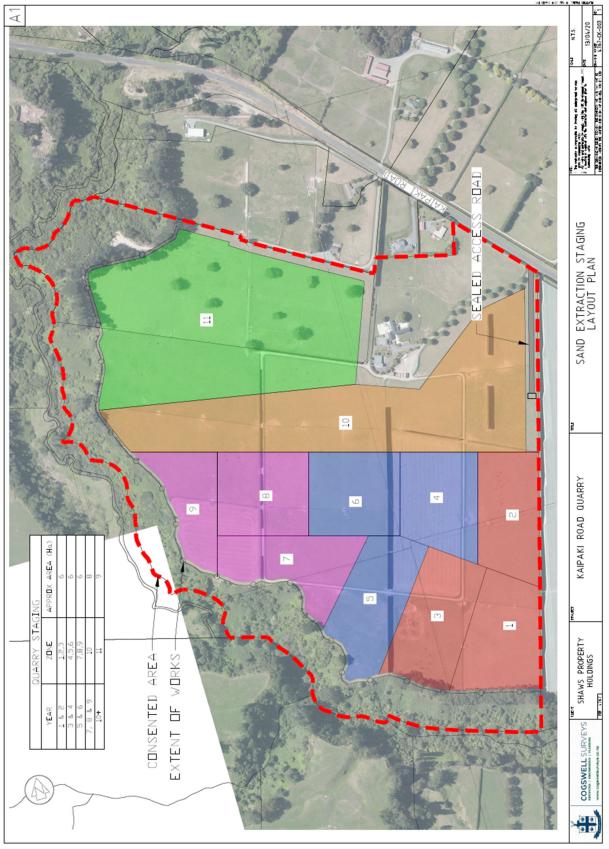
SAND EXTRACTION STAGING LAYOUT PLAN
